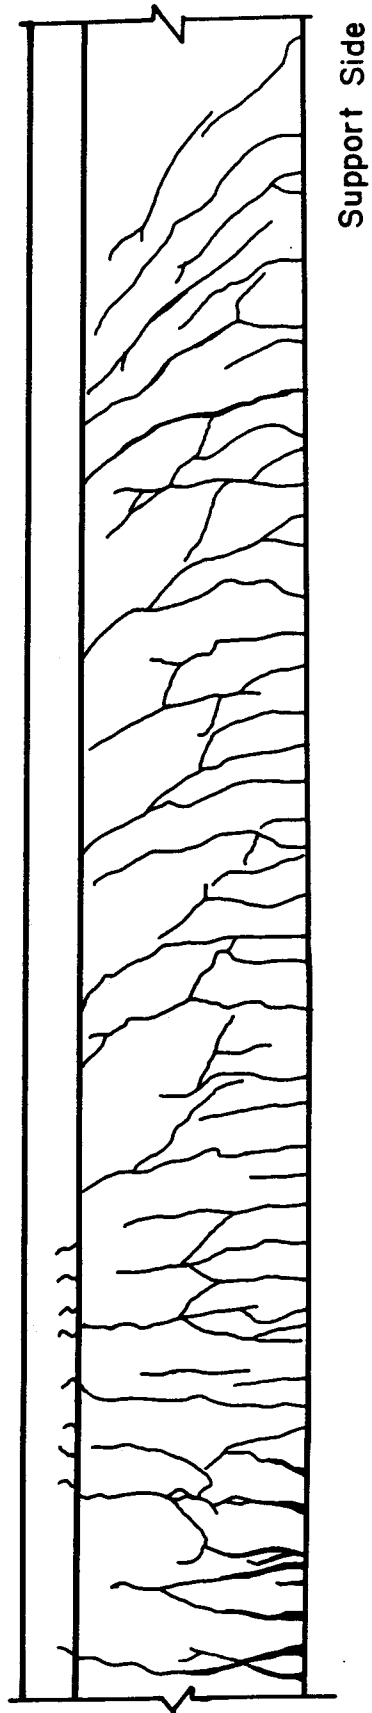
Crack Pattern - BEAM A2.
